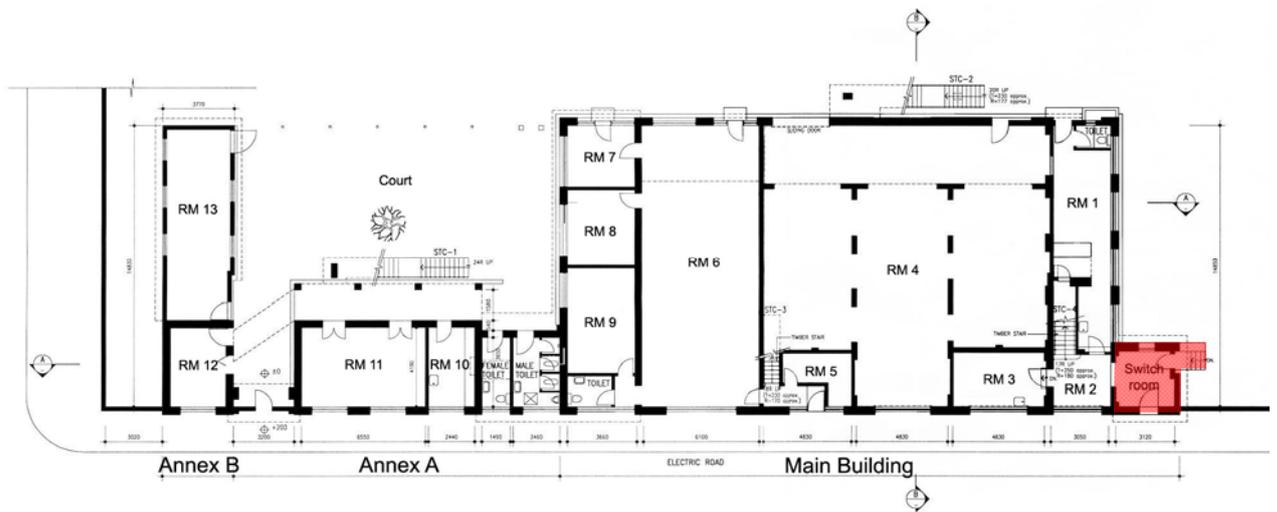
Location of the former entrance porch (switch room) on the ground floor at the former clubhouse (1:400).
